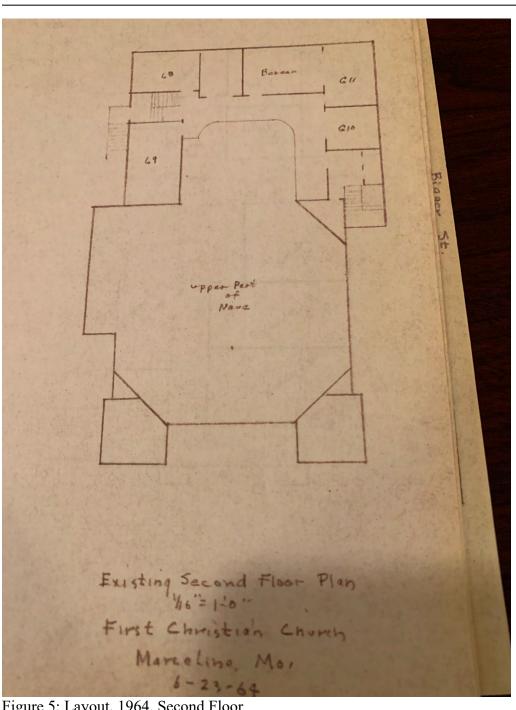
Layout, 1964, Second Floor Existing Second Floor Plan 1/16" = 1'0" First Christian Church Marceline, MO.
